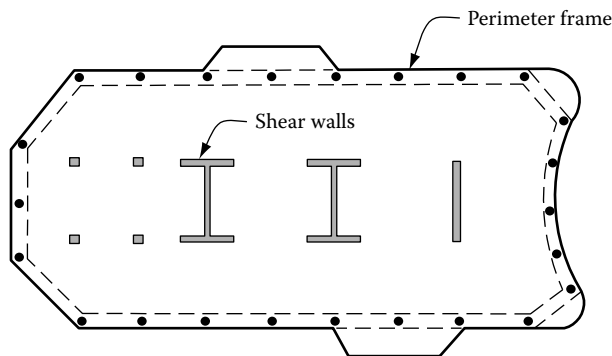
Floor plan: building with shear walls and perimeter frame.
